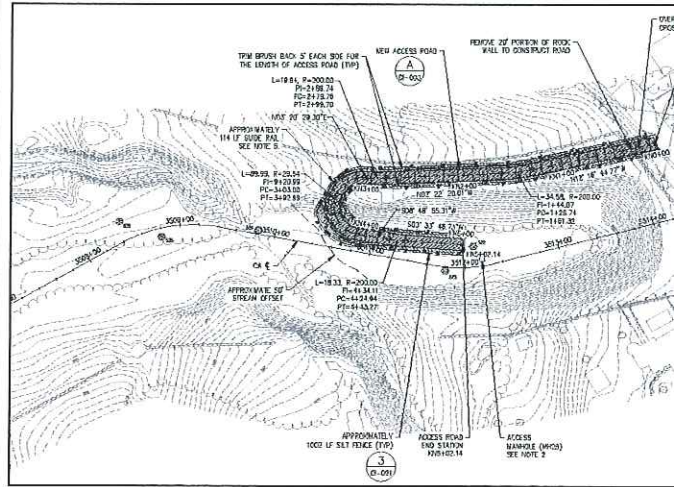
Site Plan – Pines Bridge Road Study Area
